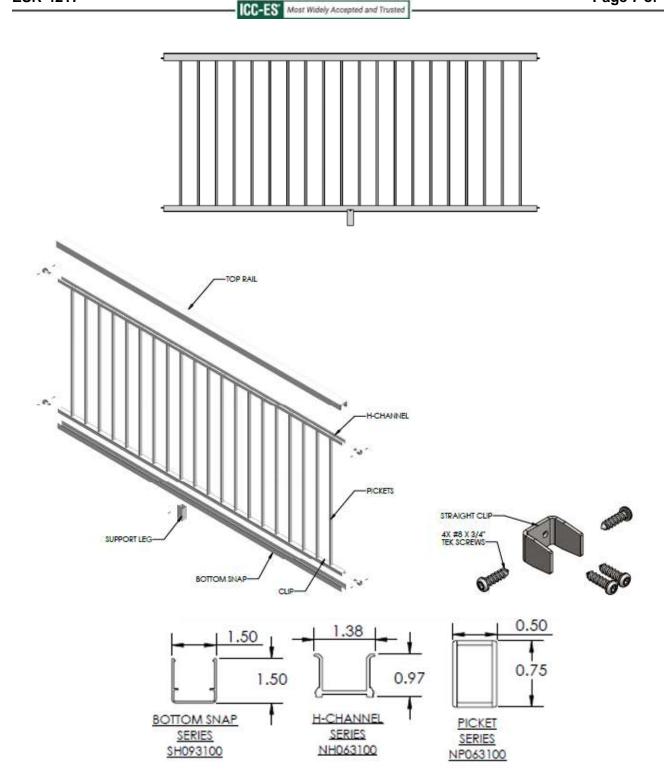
TYPICAL IRX ALUMINUM GUARDRAIL ASSEMBLY AND COMPONENT PROFILES
